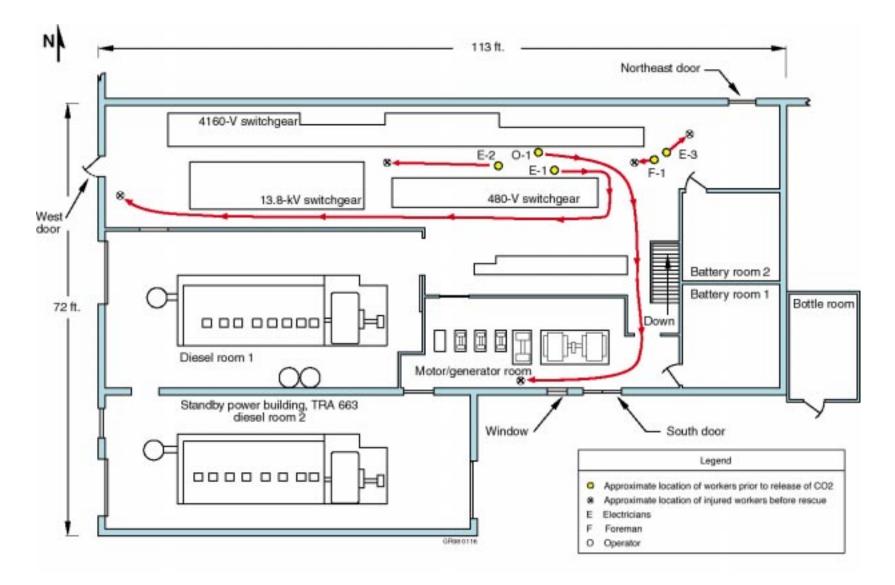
Building 648 Layout with Escape Routes of Five Injured Workers
